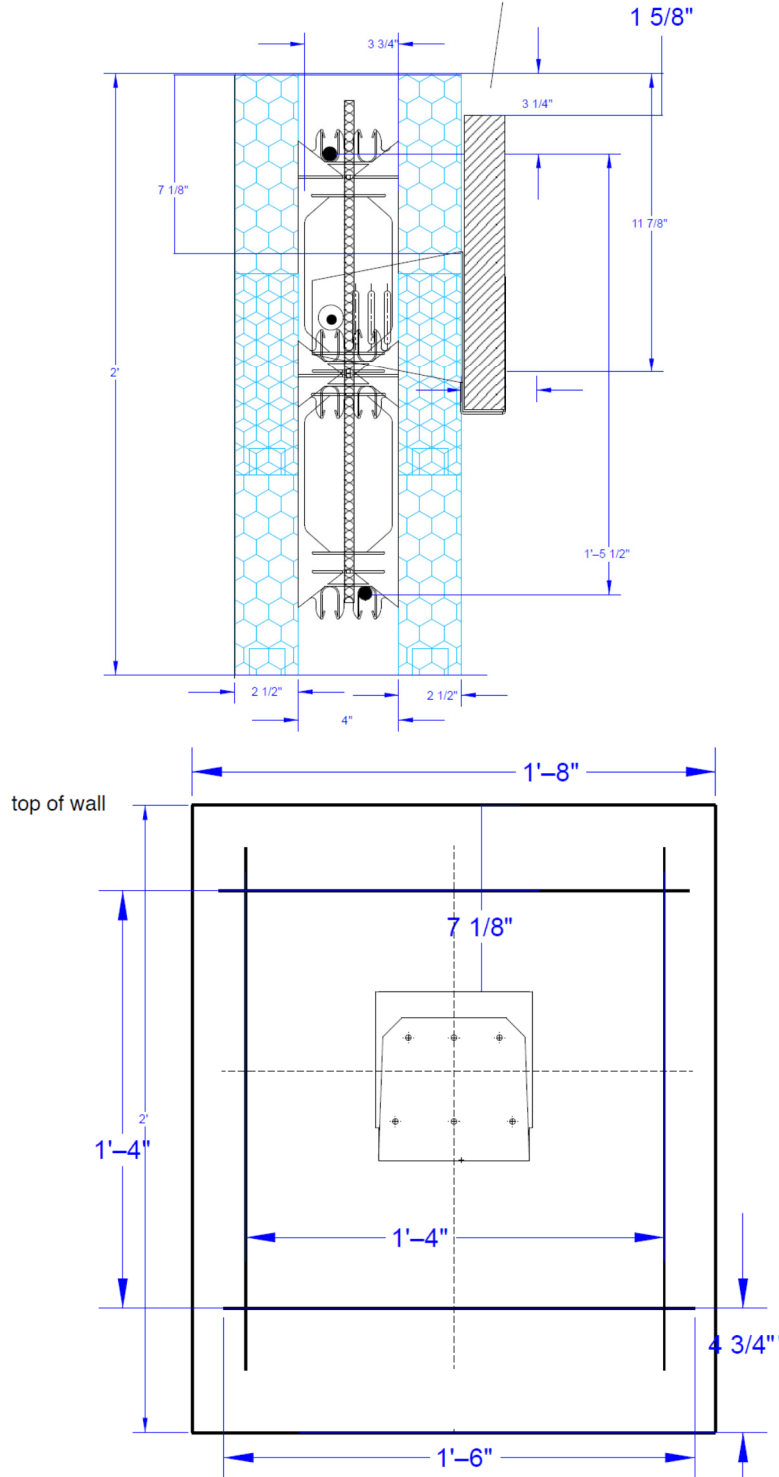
Tested specimen dimensions (drawing by RP Watkins).
